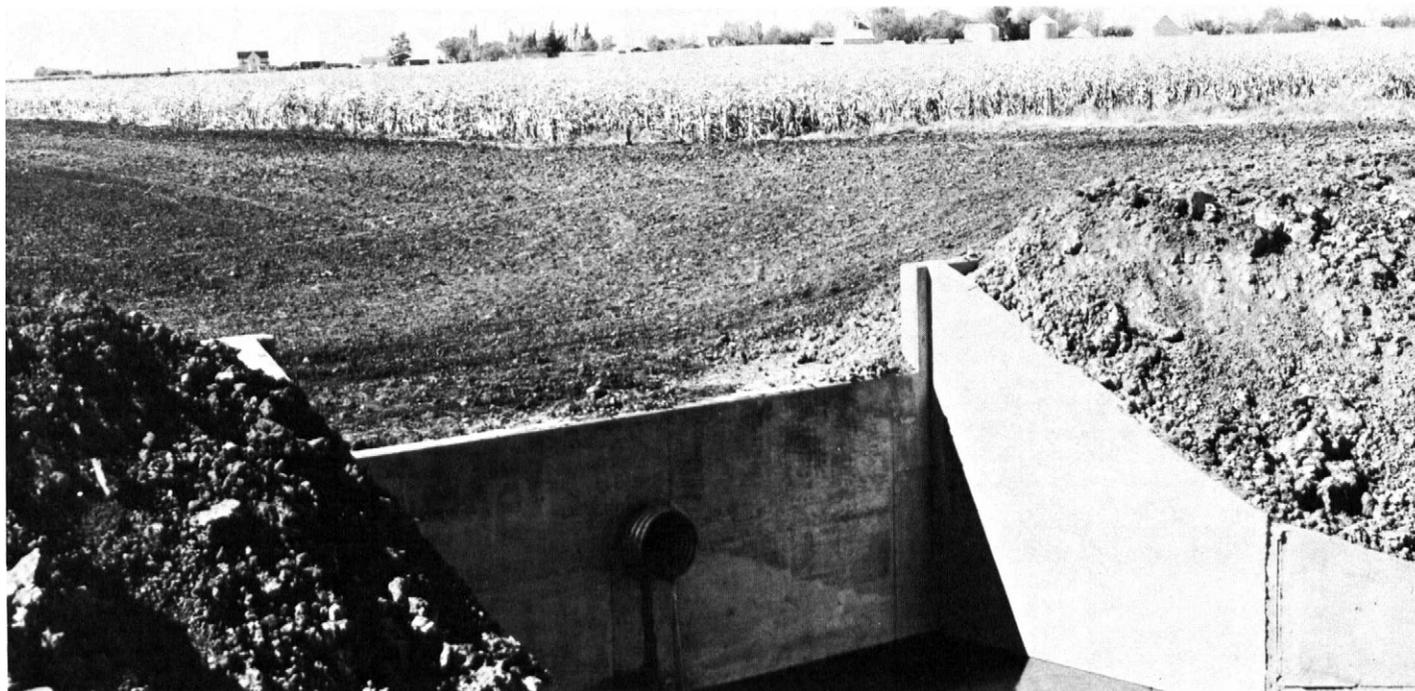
Concrete straight-drop spillway at the end of a waterway on Drummer silty clay loam.
